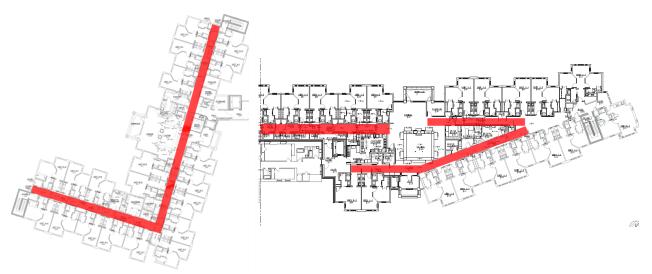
Floor Plan layout for West Wing (left) and East Wing (right)
